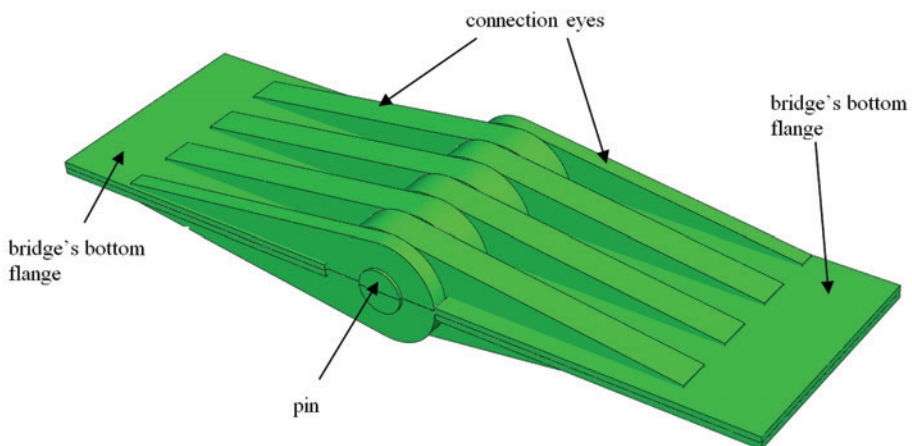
Geometry of pin joint connecting bottom flanges of span
